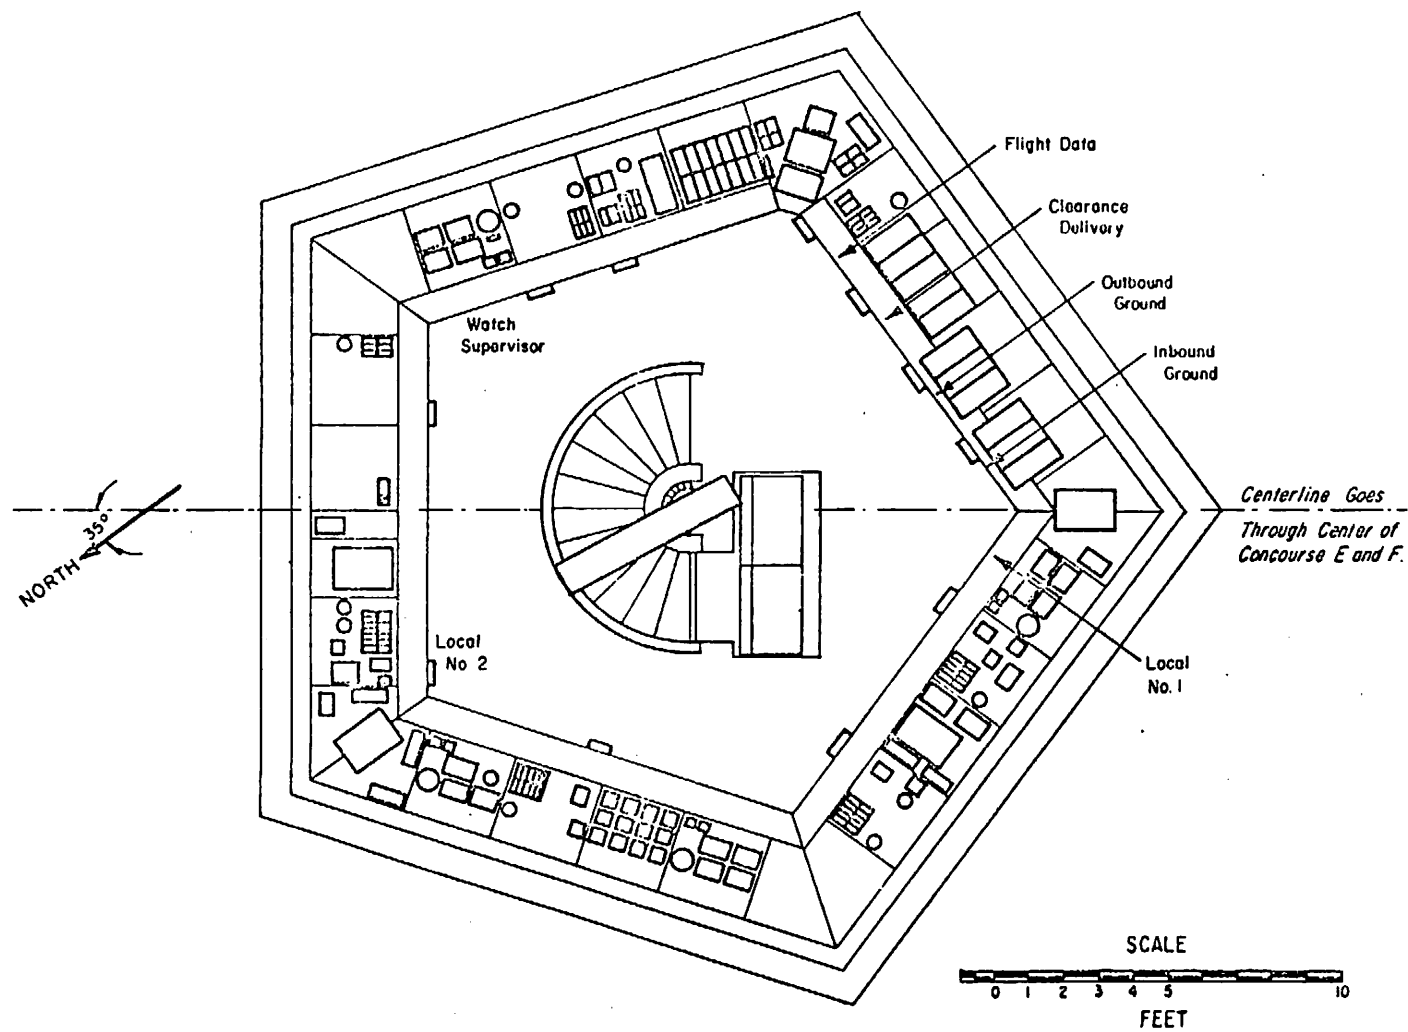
LAYOUT OF O'HARE TOWER
